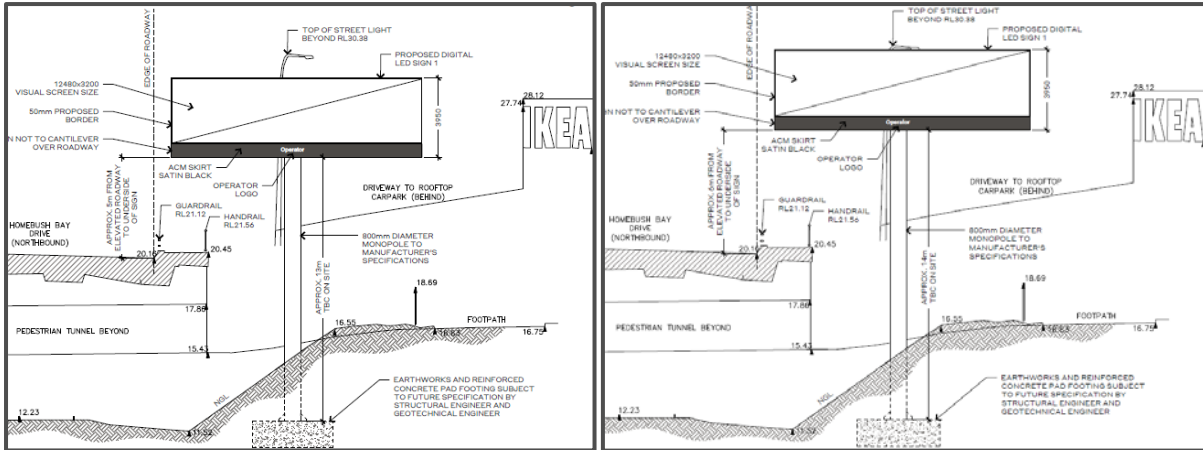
| Proposed sign: as originally submitted (left) and proposed (right) (Source: Applicant)
